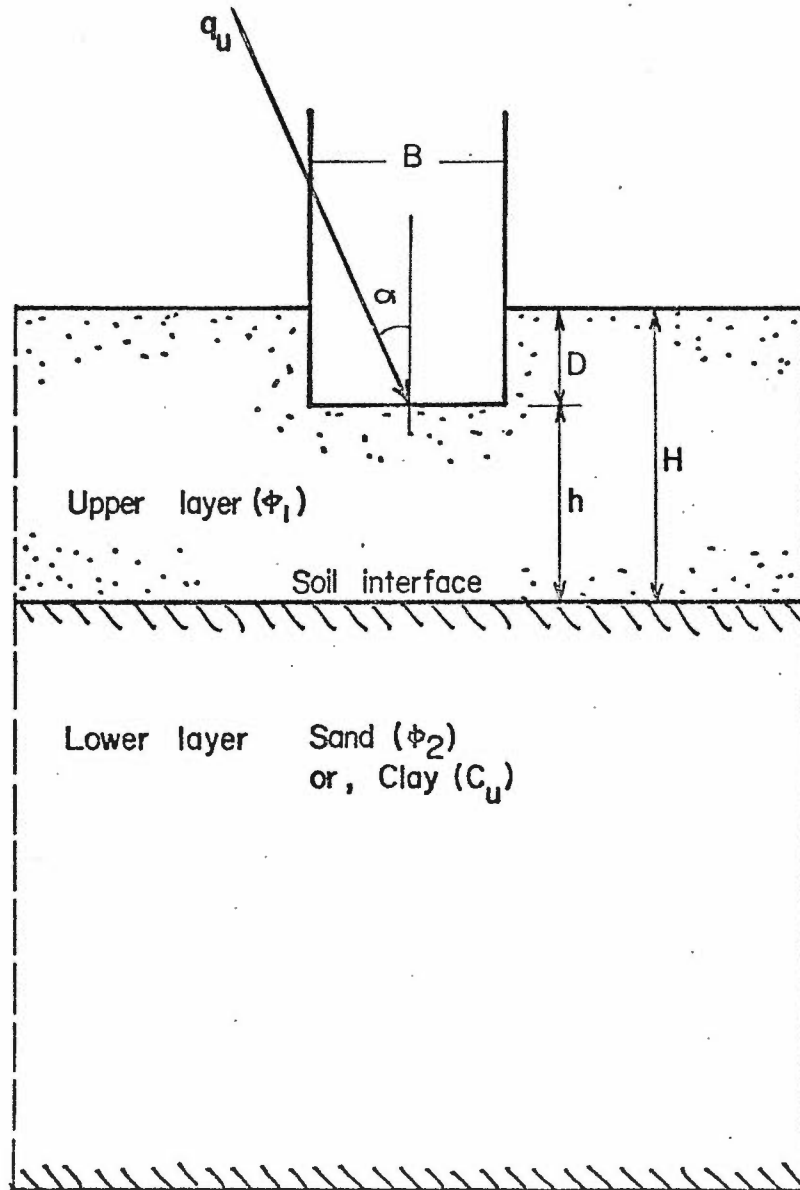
FOOTING IN A TWO LAYERED SOIL
